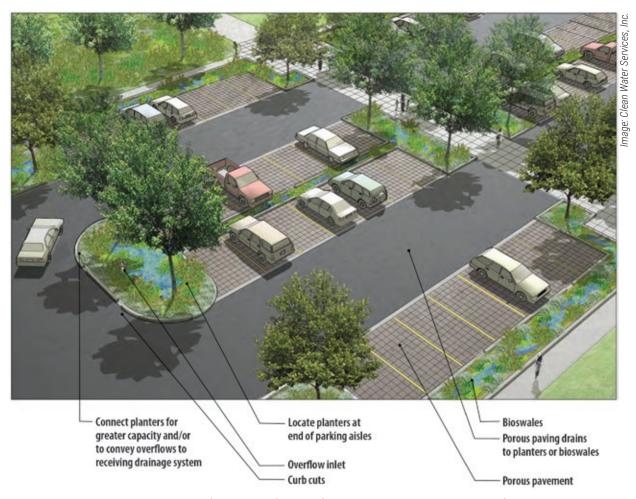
A parking lot with green infrastructure features (bioretention areas and street trees).
